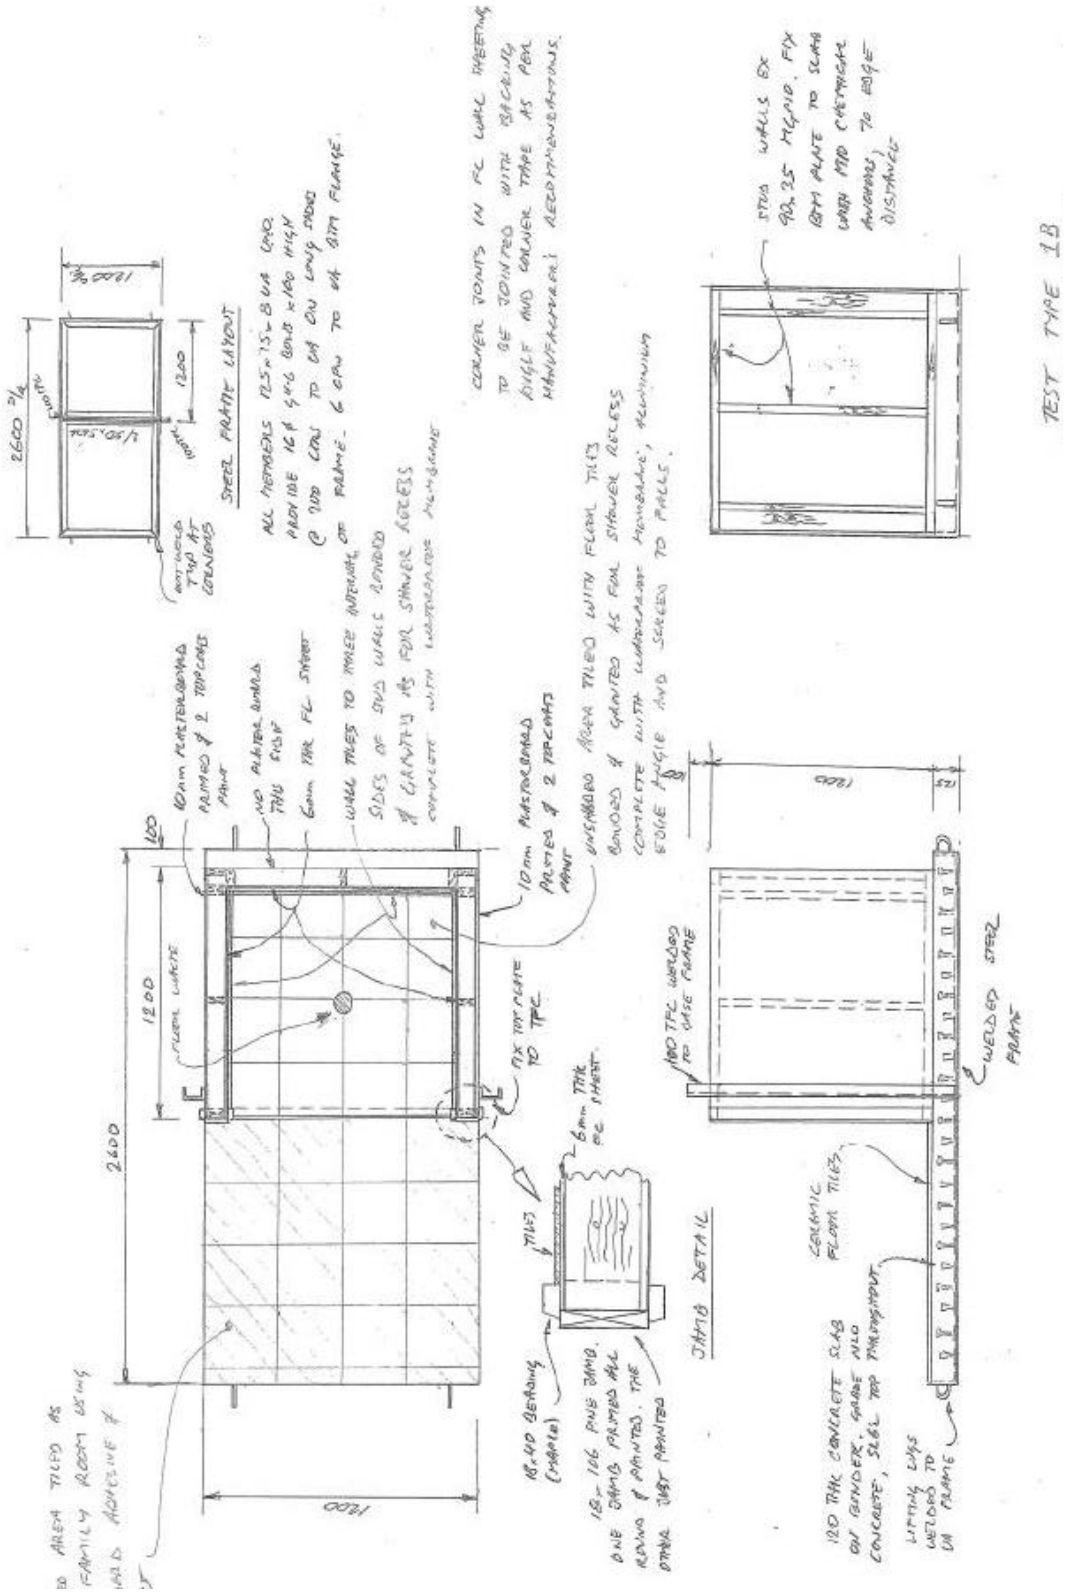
CONSTRUCTION DETAILS OF THE SHOWER SAMPLES
